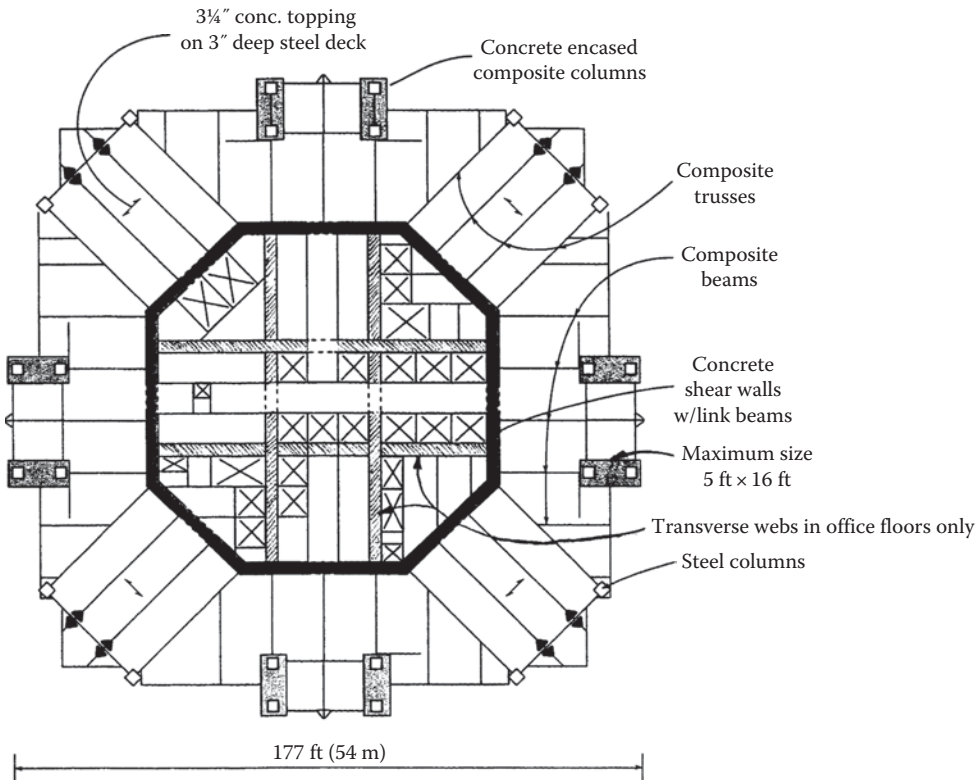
Jin Mao Tower, Shanghai, China: typical office floor framing plan.
